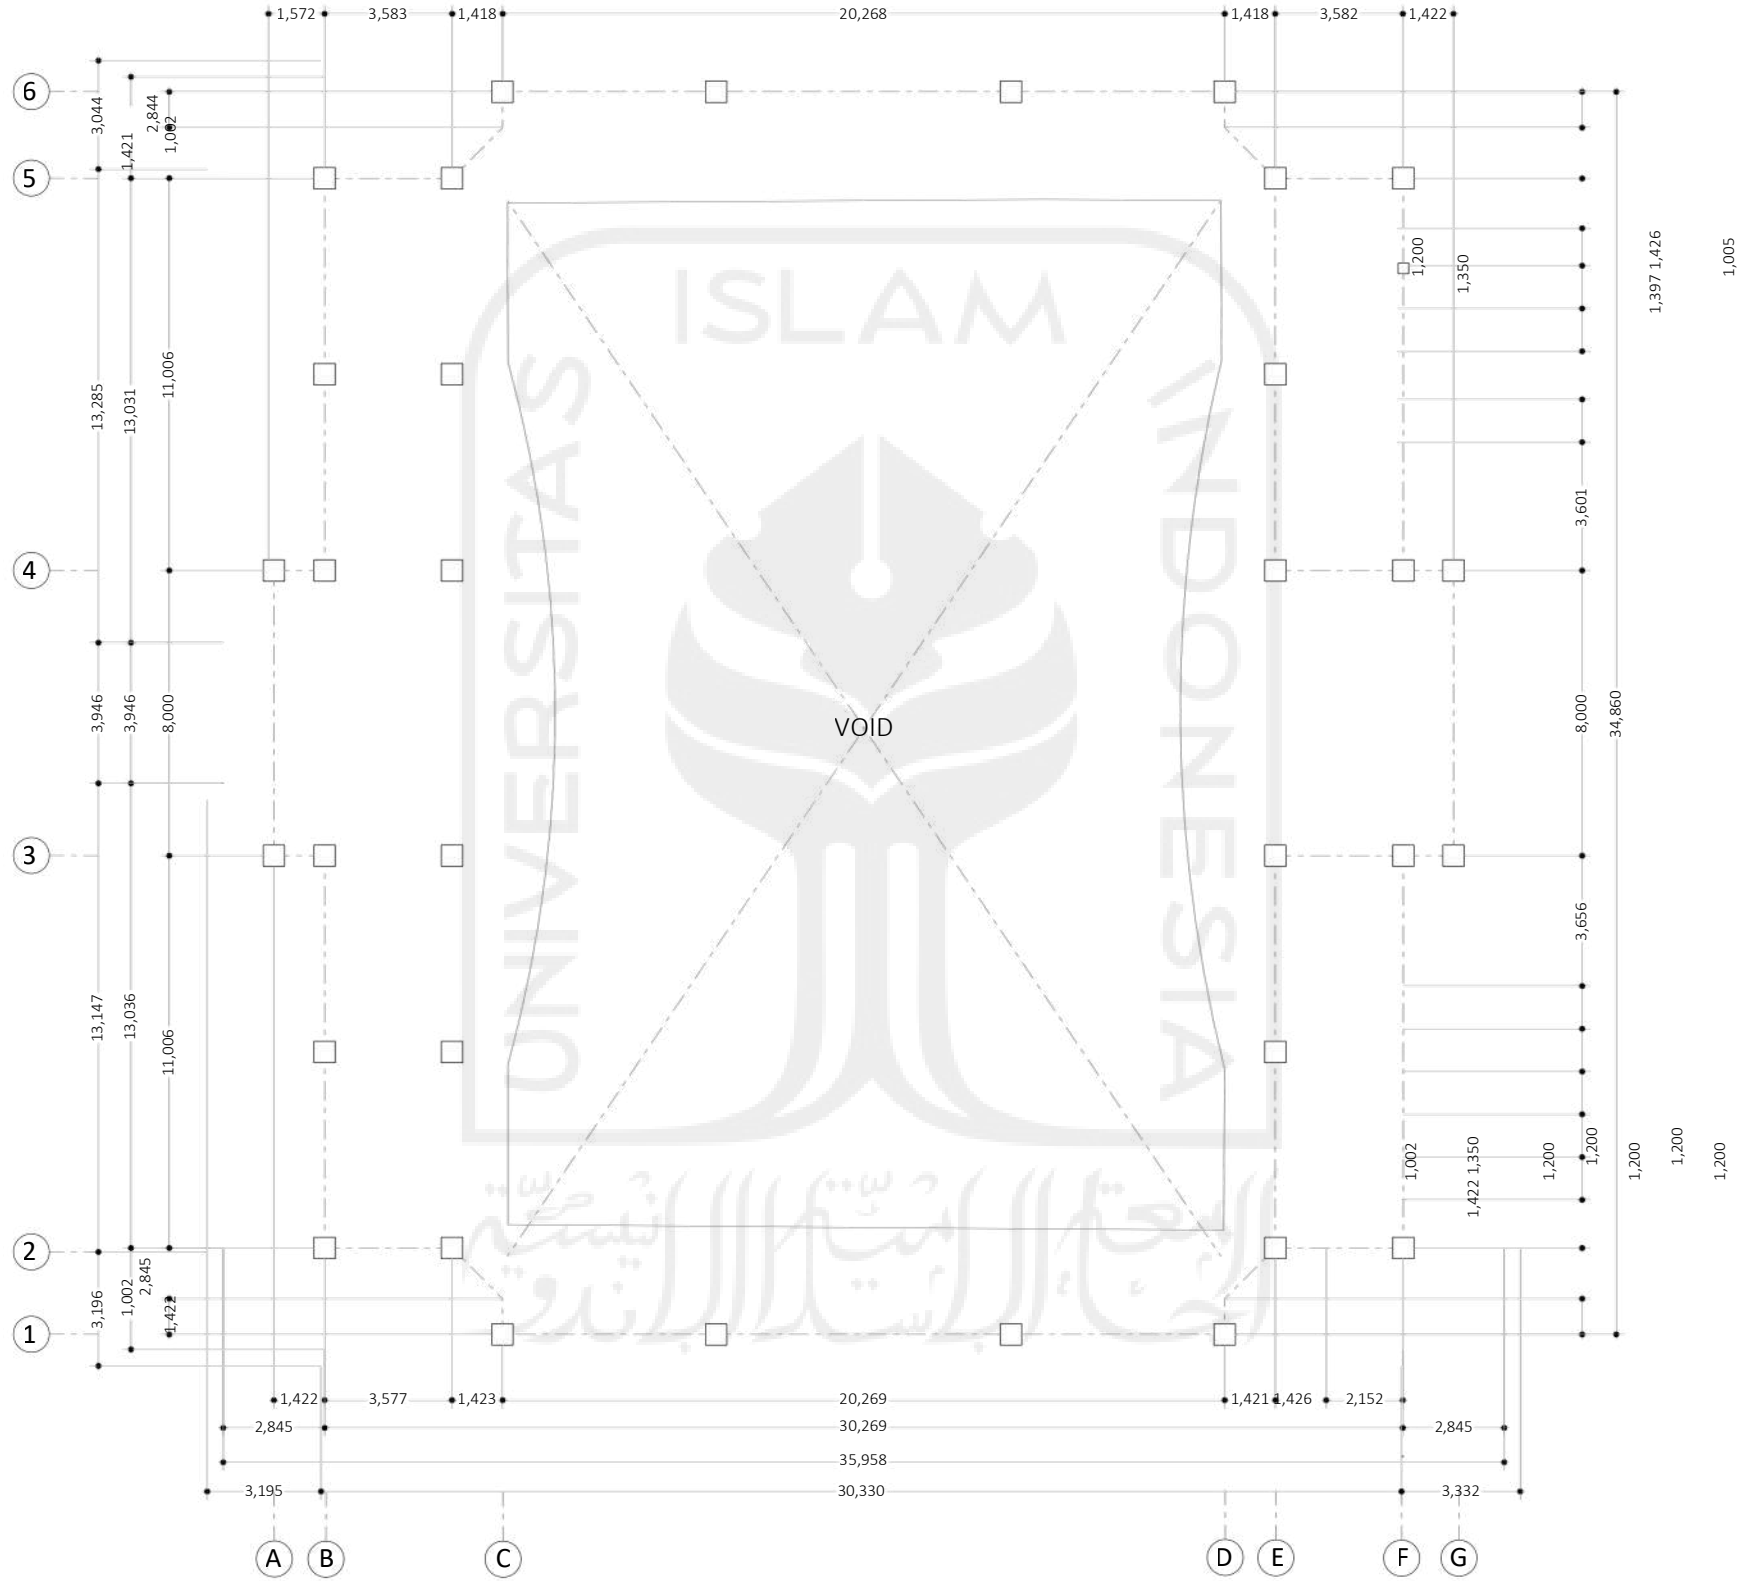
# DETAIL FLOOR PLATE 1ST FLOORS (BUILDING A2)
